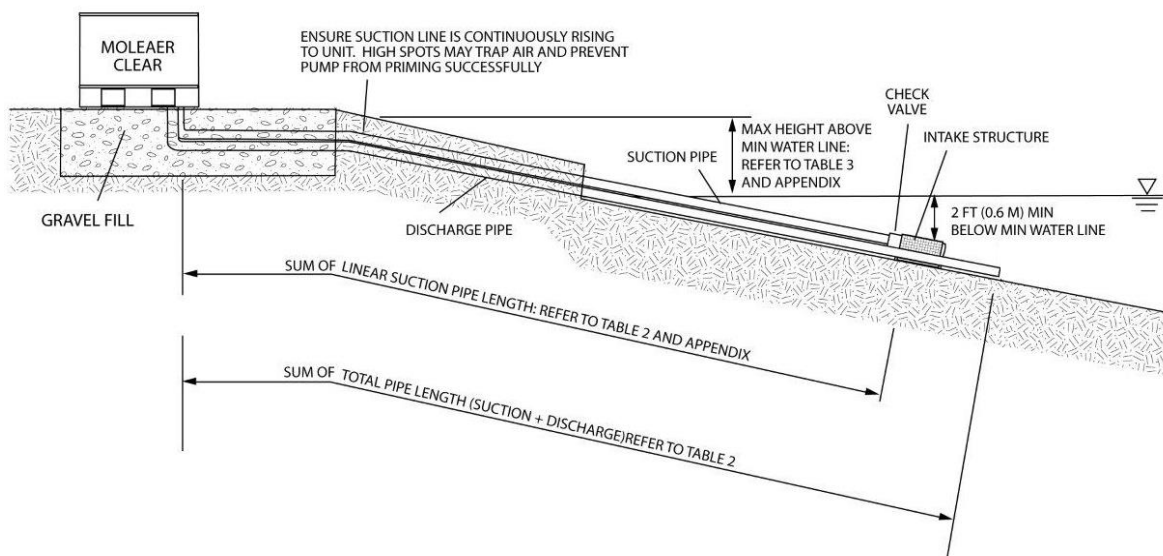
Section View of Clear Suction and Discharge Pipe Installation
